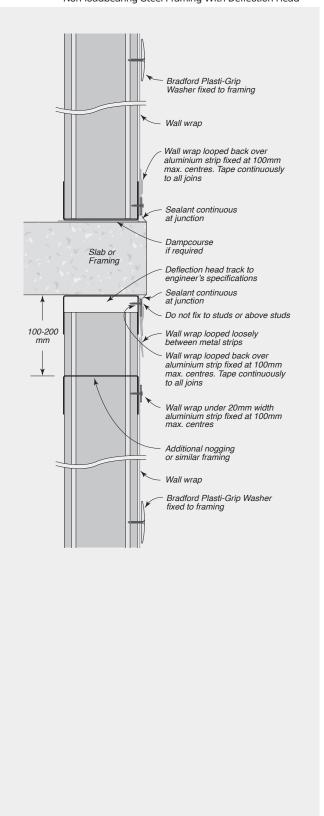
Wall Wrap Installation at Intermediate Level Junction
